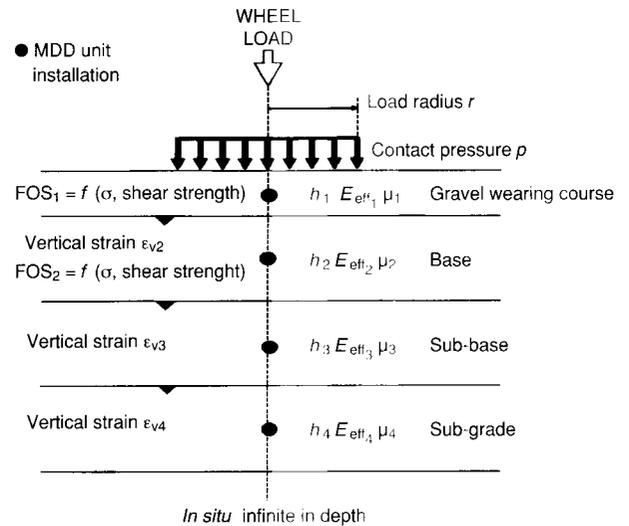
Model of a layered elastic pavement for mechanistic structural design and analysis
